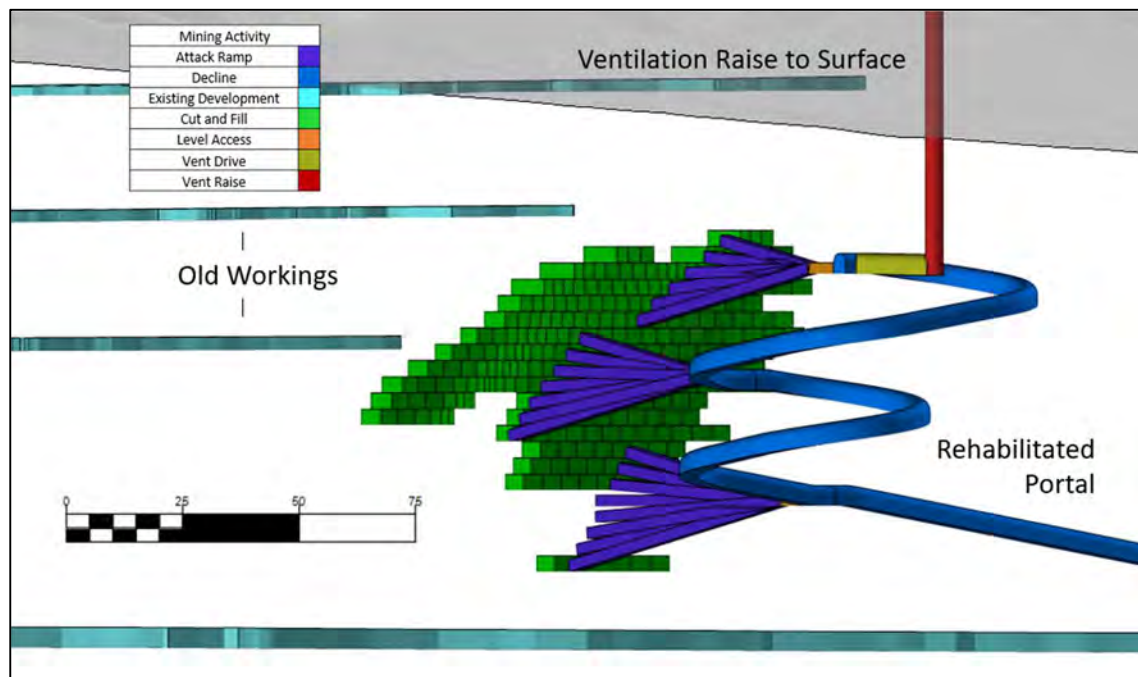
Lucky Queen Isometric View (Looking South).
